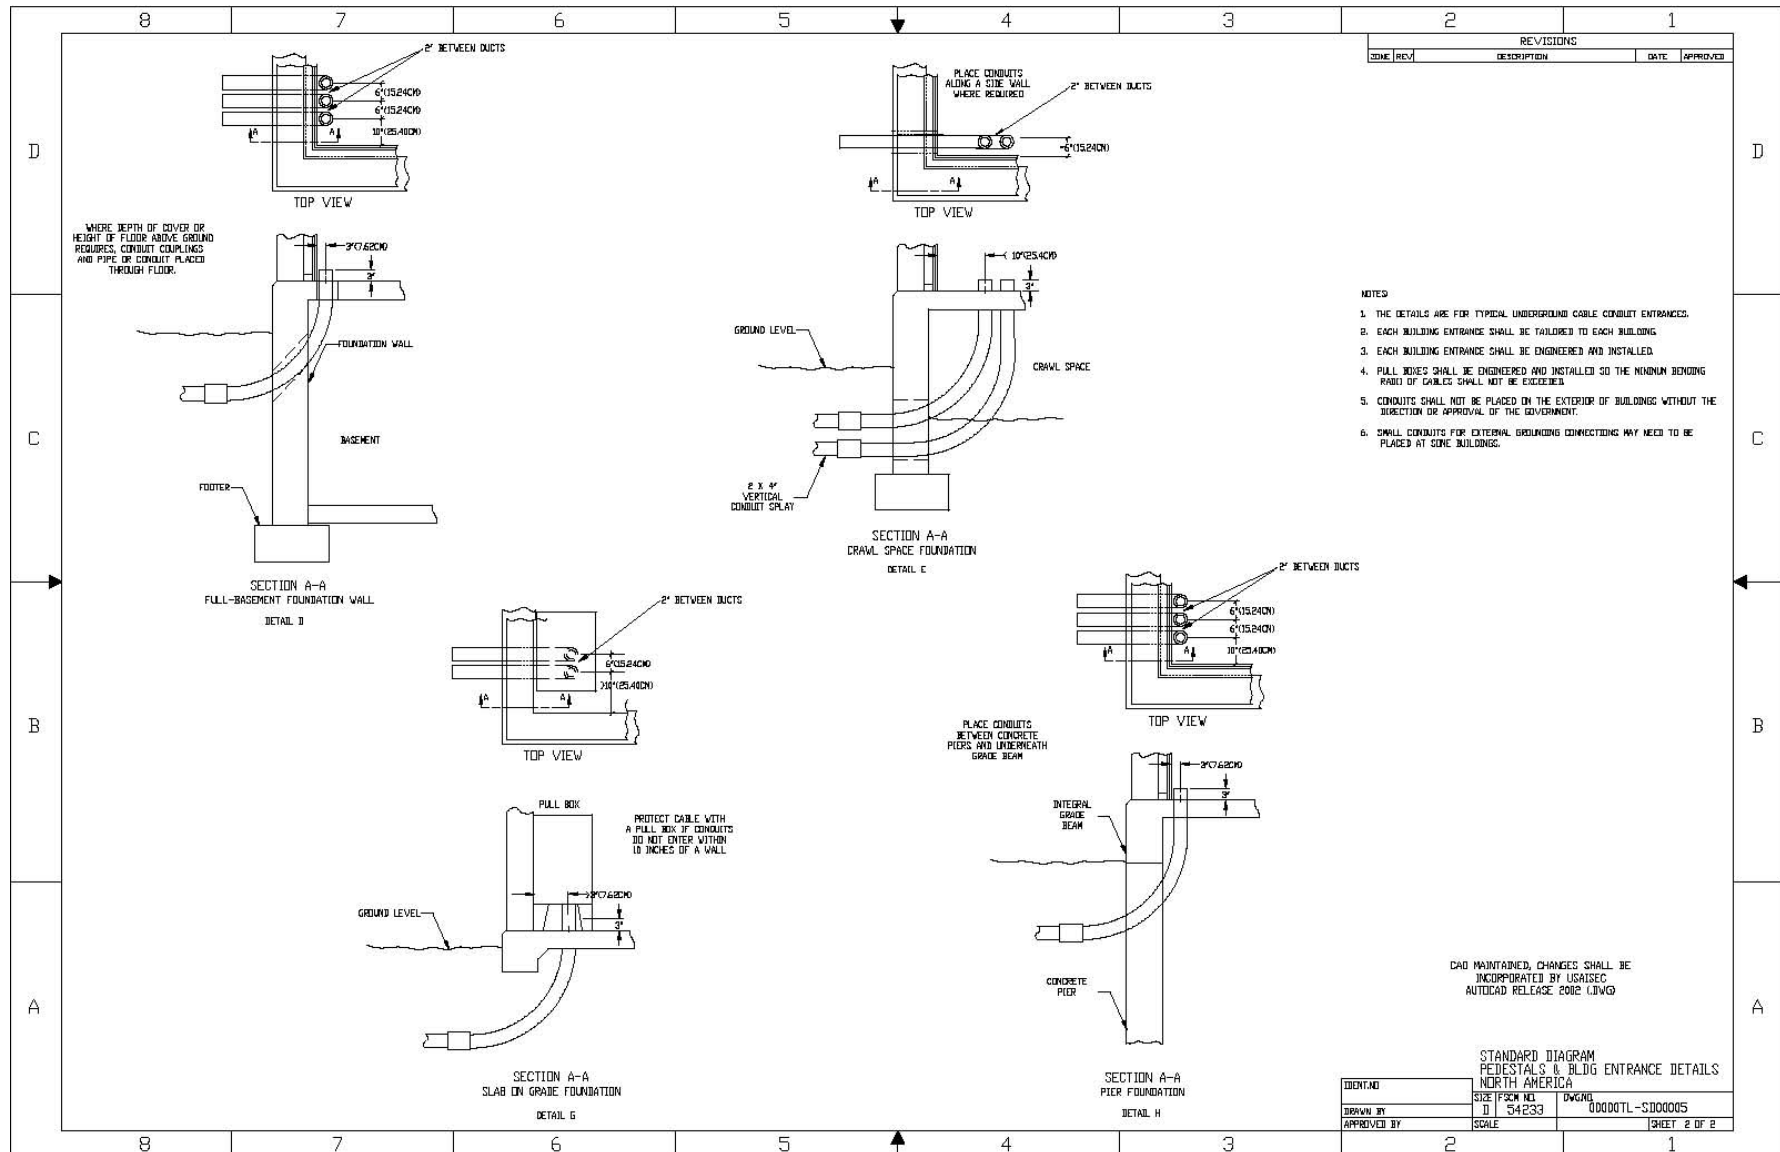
Pedestals and Building Entrance Details – North America (2 of 2)
